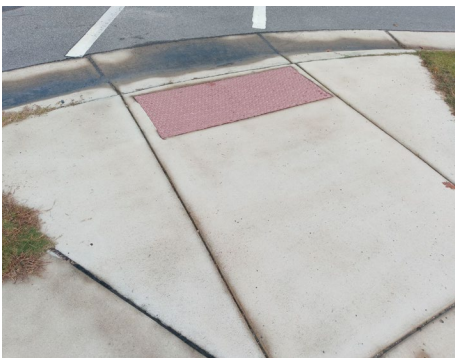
Southern Pedestrian Crossing at Lot 32, Facing Northwest
